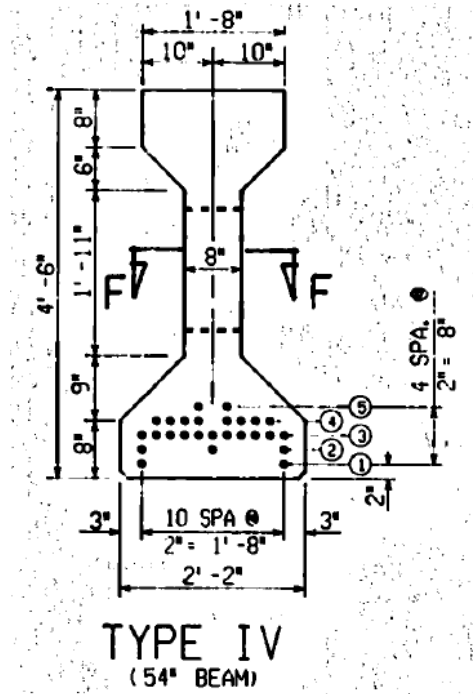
AASHTO Type IV girder dimensions and reinforcement details
